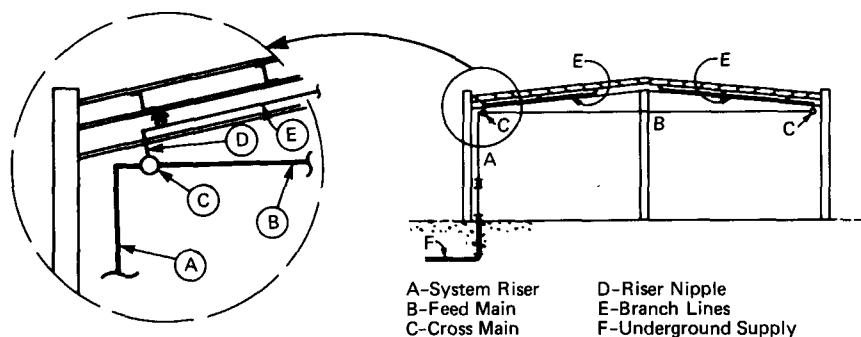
Building elevation showing parts of sprinkler piping system.
